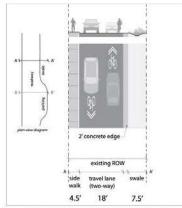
Neighborhood Street Expanded ROW -30' ROW + Natural Drainage Section Cut A (for use where on-street parking is not important)
